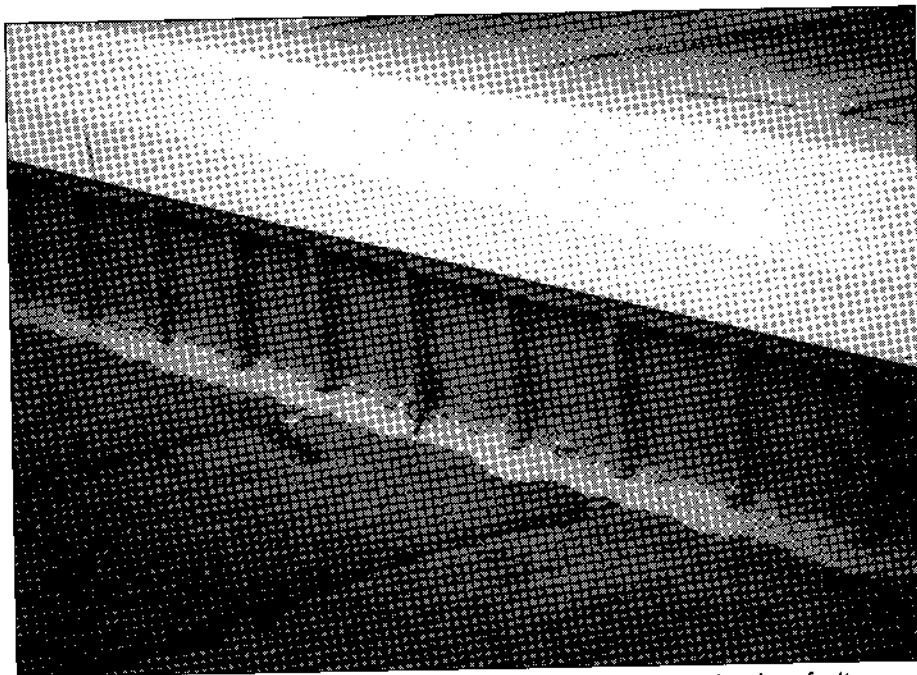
Roof 63: A low wall occurs between upper- and lower-level roofs. It appeared that the low roof/wall intersection was poorly detailed in the original construction. When the roof was reroofed, the existing awkward condition was not changed. Unless this detail is periodically repaired, premature leakage is likely. This five-year-old roof is located in New York.
